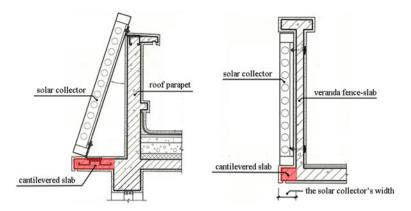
Two examples of detailed conformation design of solar collectors integrated on building envelopes vertically or at a certain tilt angle with cantilevered slabs (06J908-6)
